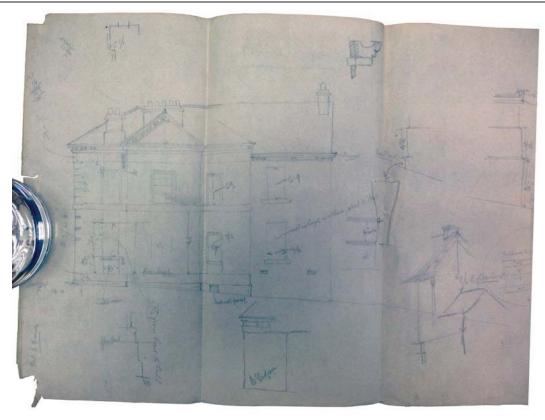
Proposed south elevation of the council buildings, c1903 (CAC(B) Z/1028/1 c1903)
